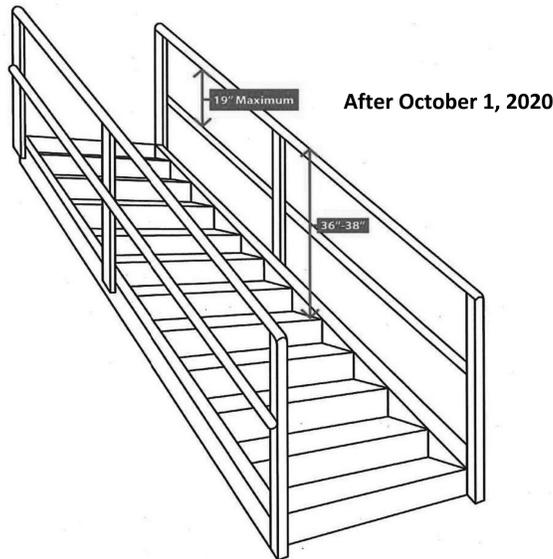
Combination Handrail and Stair Rail Installed after October 1, 2020
